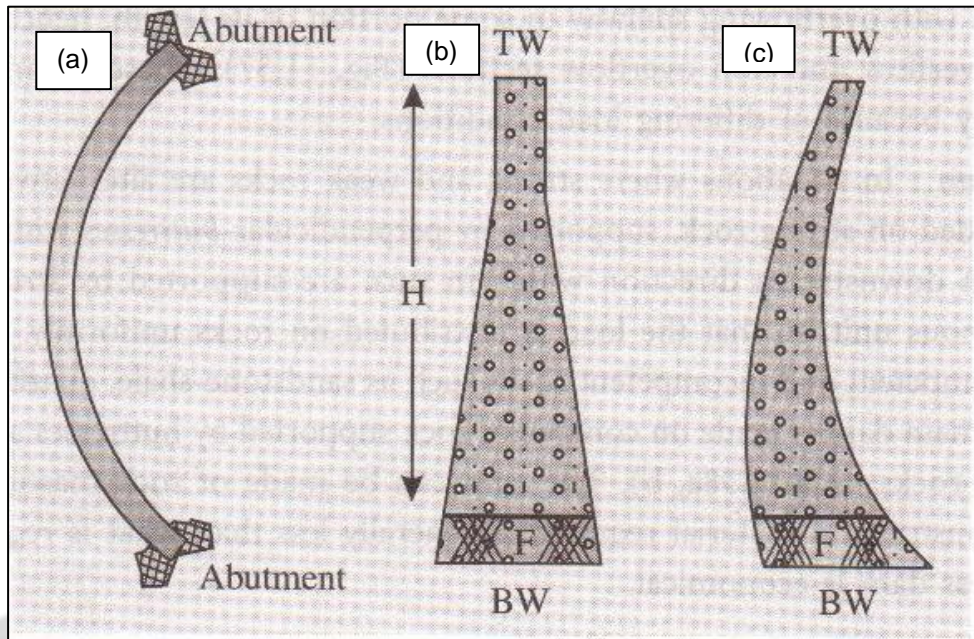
Arch dam as seen in (a) plan, (b) cross section of single arch and (c) double arch dam. H – Height, TW - Top Width, BW - Base Width, F – Foundation.
